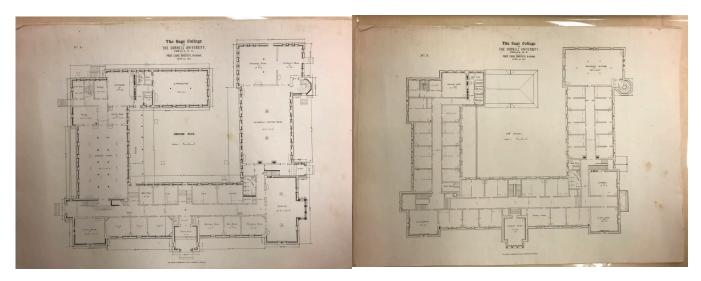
Sage College Floor Plans, Ground and Second Floor, ca. 1874, Kroch Archives.
